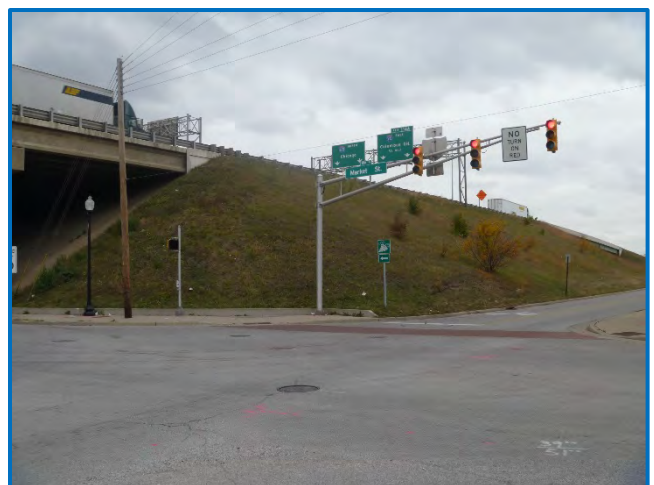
View of INDOT's right-of-way near the I-65 bridge over Market Street facing northwest (10/30/2015). No roadside ditch or water resources were observed.
